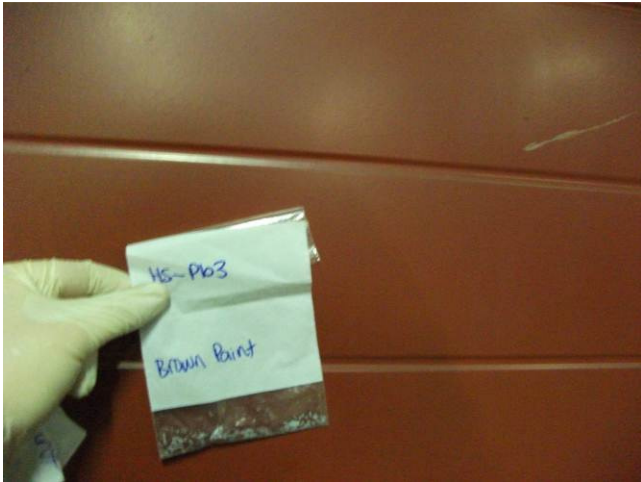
Heated Storage Building – Lead-Based Red Door Paint
